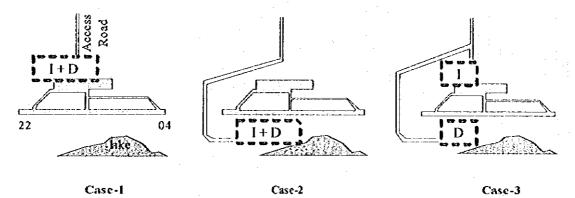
Alternative Locations of New Terminal Area
